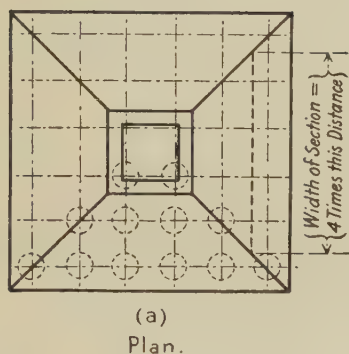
Typical Sloped Reinforced Concrete Footing on Piles.
